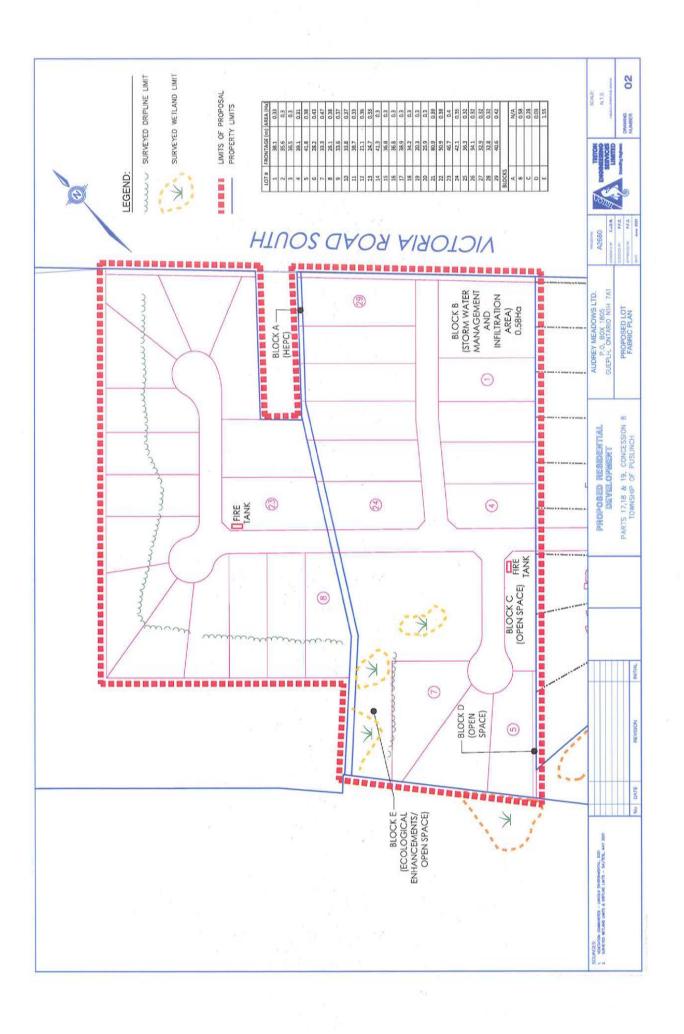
sets out a preliminary concept layout for the development. There are 29 lots proposed. The Plan of Subdivision will formally establish the number and distribution of lots at a later stage in the process. As part of this future study requirement, lands for stormwater management, ecological buffers and the open space system will be examined and delineated in more detail on the Draft Plan of Subdivision. However, preliminary Stormwater Management work has been completed in support of Drawing No. 2.
